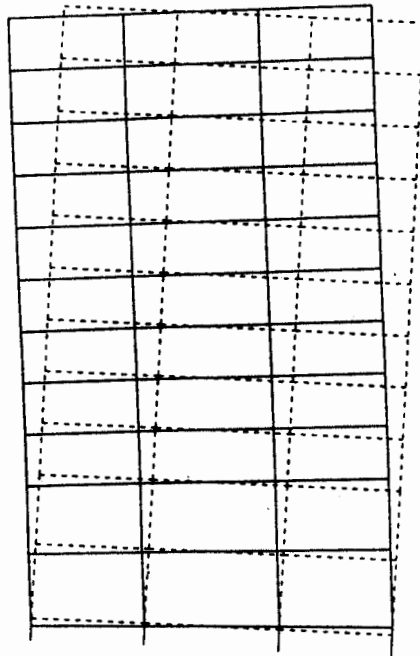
Building #3 - 9 Story Government Office Building, San Bruno
